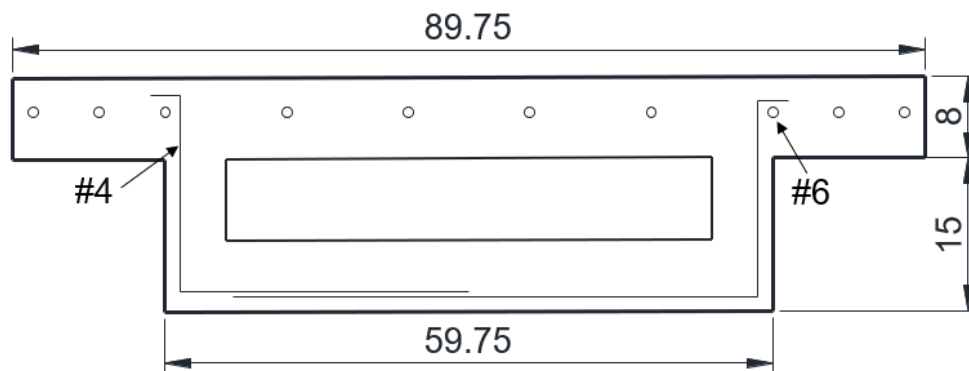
The cross-section geometry and reinforcement detail for 7DS23
